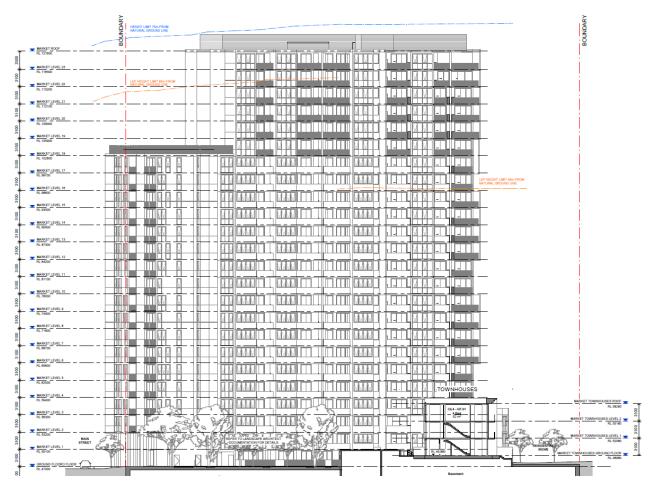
Placeholder – section of C4 showing mapped building height lines (orange)
